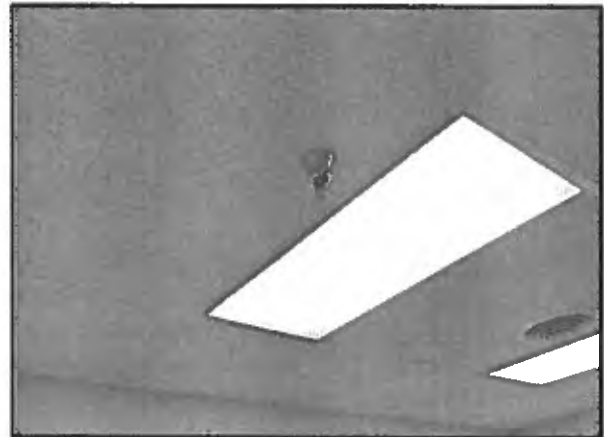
Example of Receptacles (Typical Throughout Building)
